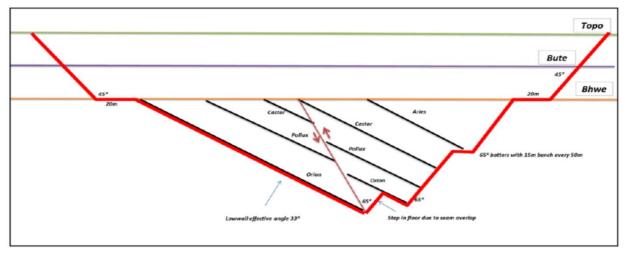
Highwall and Endwall design for the maximum pit
